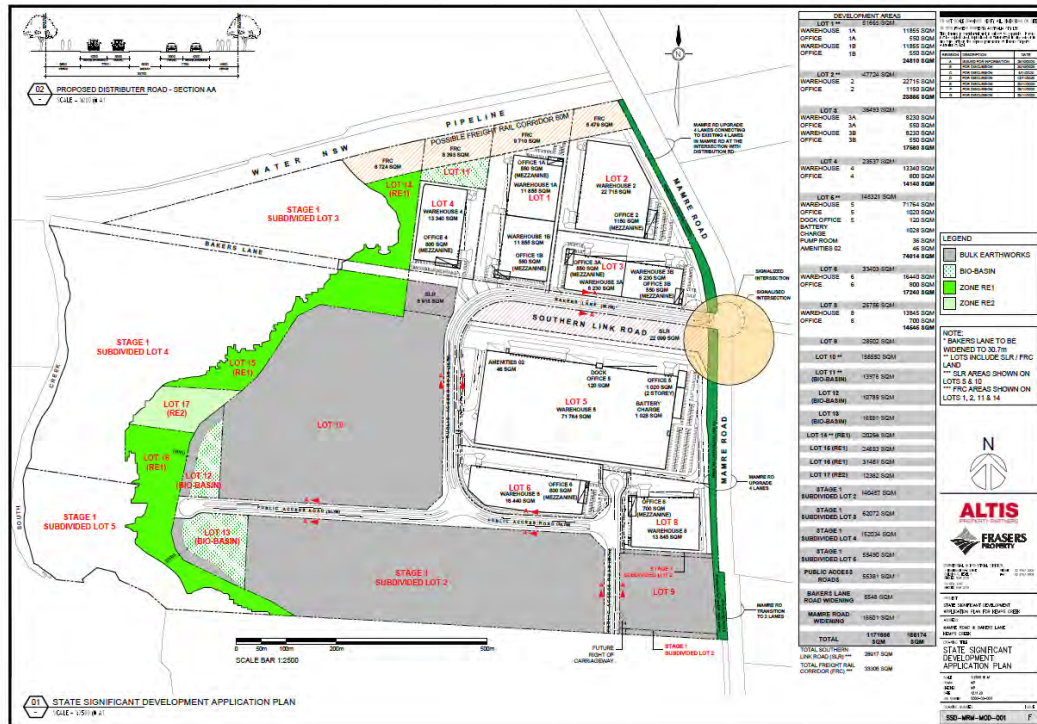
SSD-9522 Mod 1 Masterplan Layout
